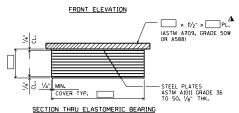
PLATE 'E' DETAILS (SEE STD. 40.10 FOR CONCRETE BLOCK ALTERNATE)
